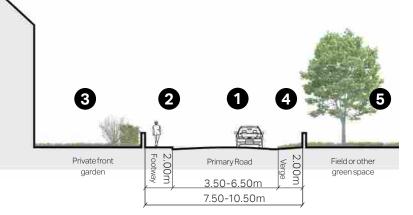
Section showing indicative dimensions for primary routes (road width may vary to provide space for parking)
